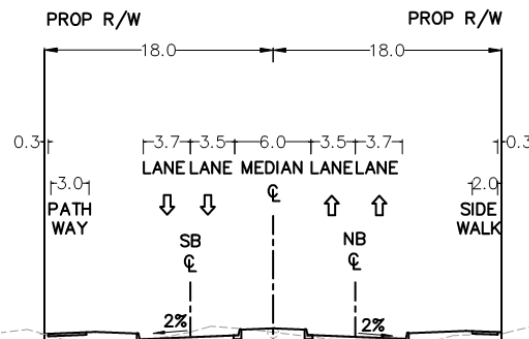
NORTH OF GLENMORE TRAIL, 100 ST SE CROSS SECTION (LOOKING NORTH)
